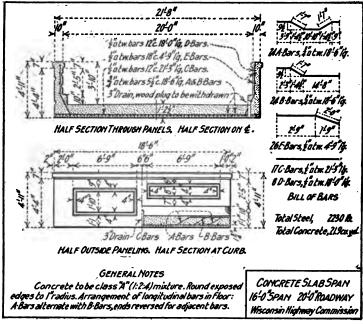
REINFORCED CONCRETE SLAB BRIDGE.
